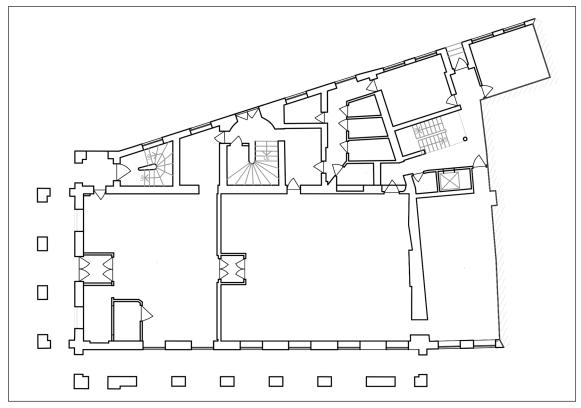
The ground-floor plan. [Plan based on the asset management floor plan of the Isle of Wight Council's Corporate and Facilities Management team]
